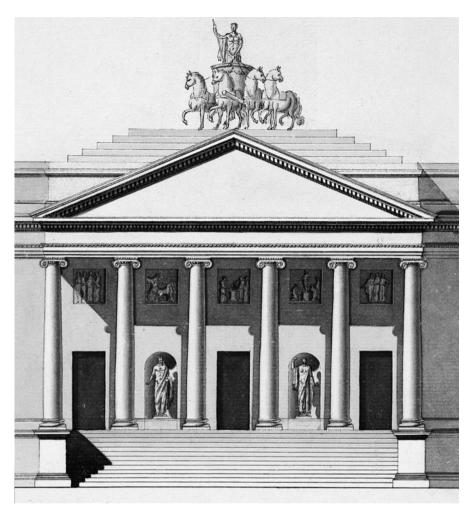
St. K. Potocki, V. Brenna Laurentina Villa, elevation of the sea façade, detail (WAF 67, J. Rys. 5.003)
